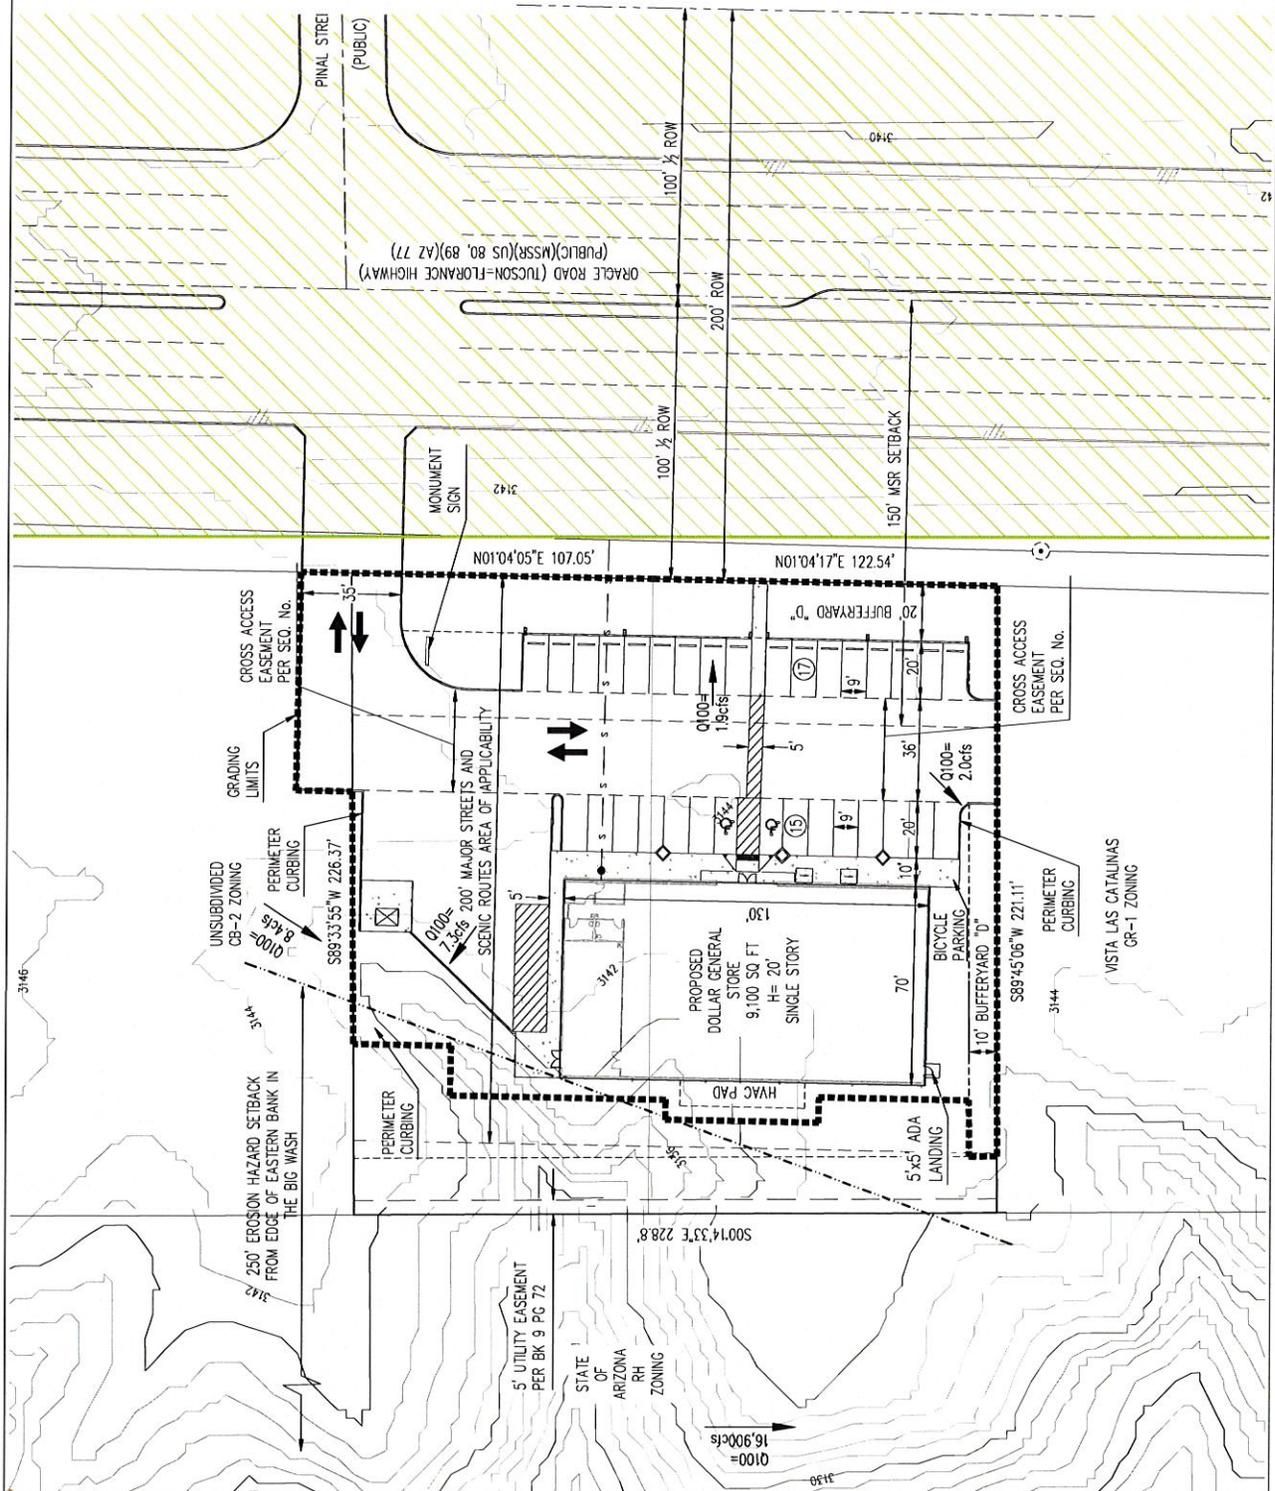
PRELIMINARY DEVELOPMENT PLAN
